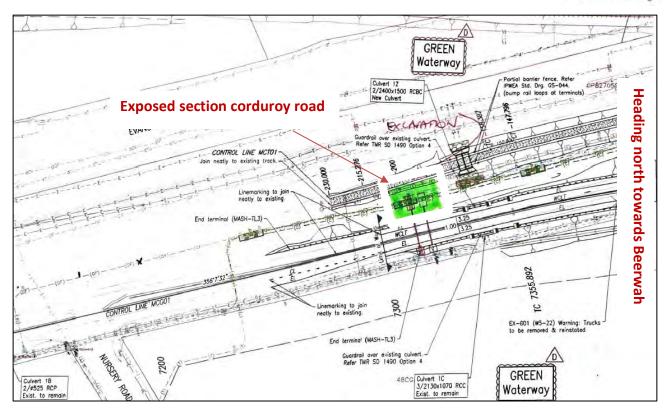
2022 plan showing location of discovery and assumed extent (Source: Adapted from TMR/Aurecon, B2N Rail Upgrade Project, General Arrangement Sheet 1 of 7, 18/10/2022).
